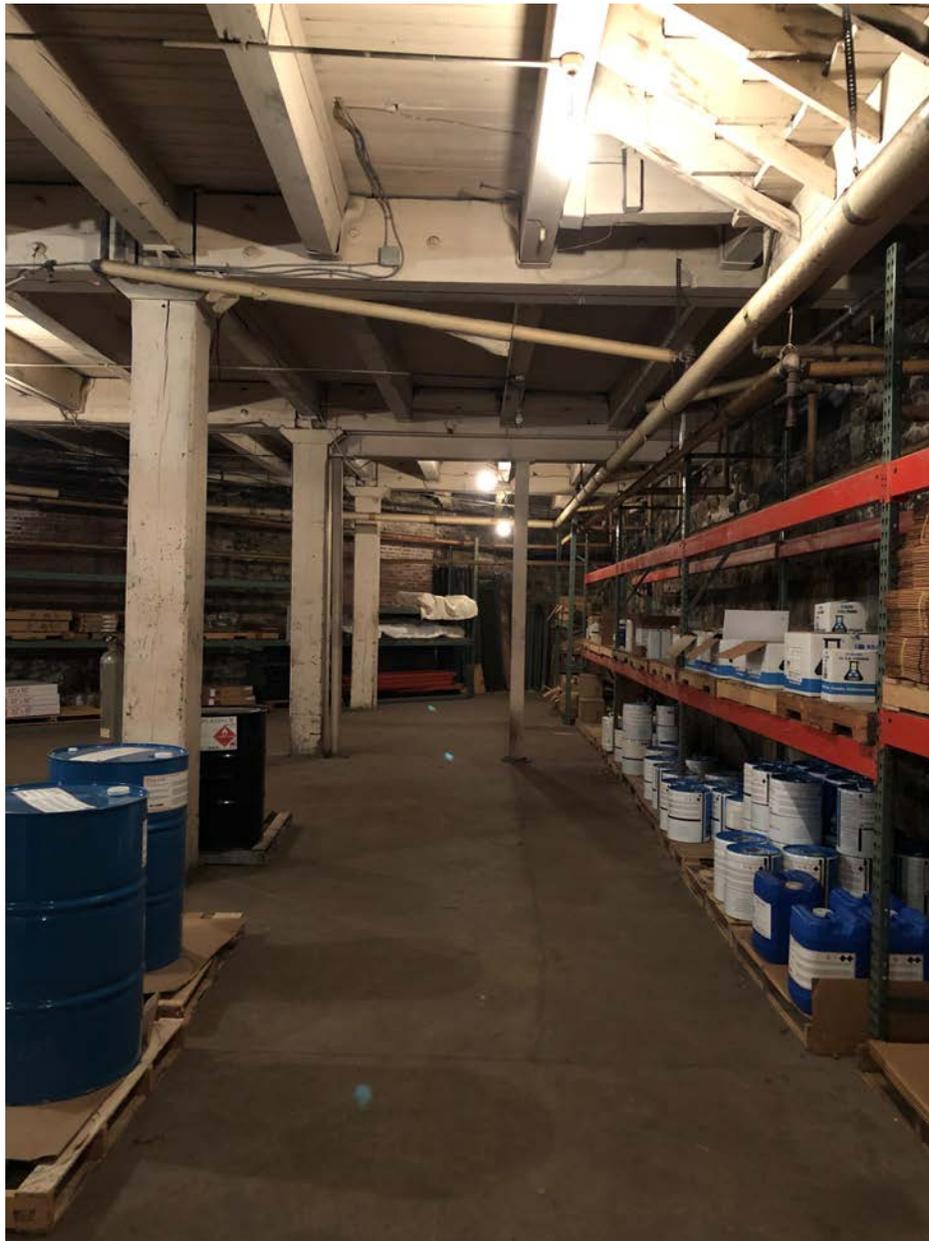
Basement, looking east in the older section of the building, showing the underside of stairs in the upper right corner, which existed inside the main entrance prior to the elevation of the street c. 1929.
